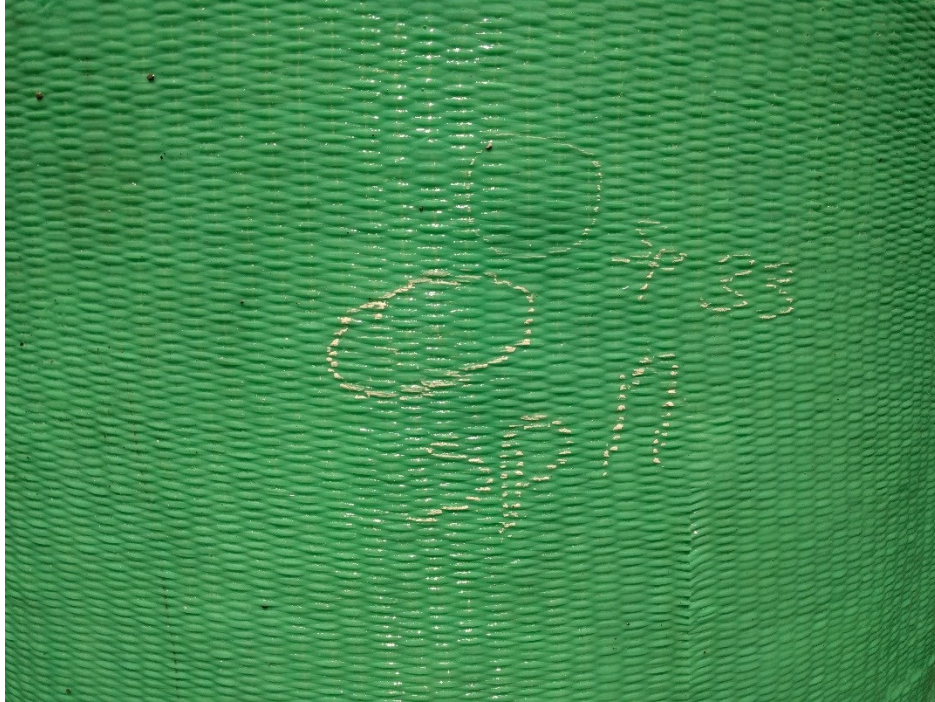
Elevated tap hammer readings on the east column of pier 3.
